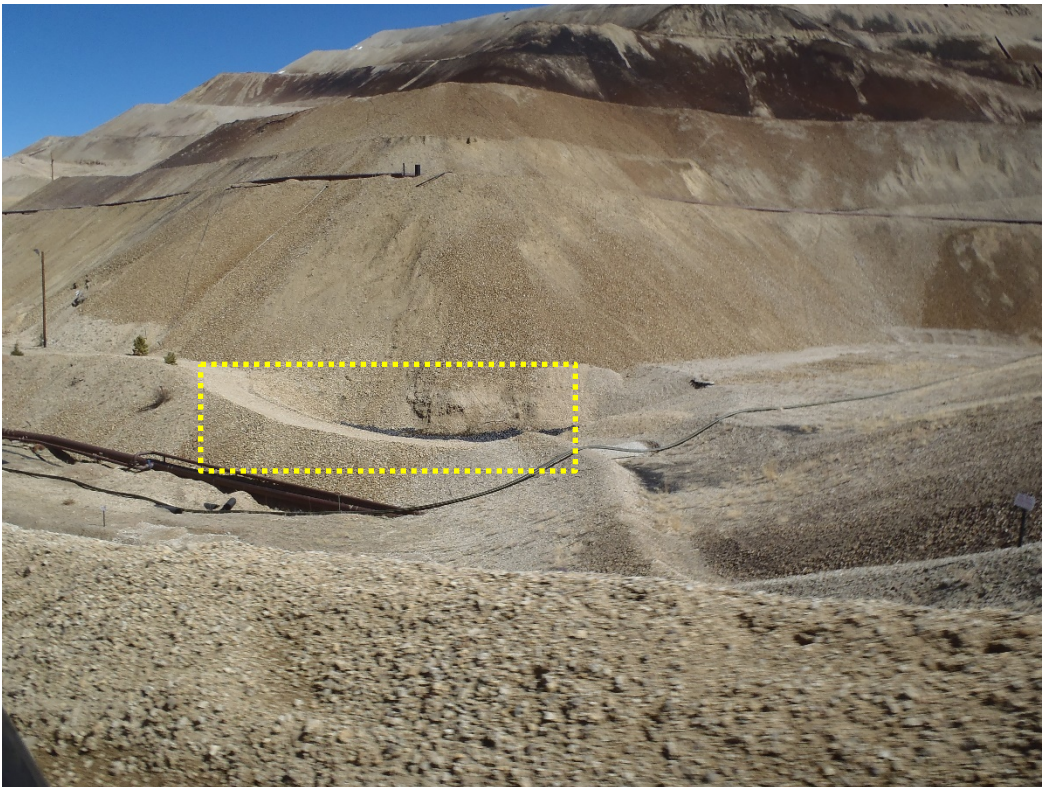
Widened embankment on SW side of PSES holding pond (note low point directs overflow off liner).
